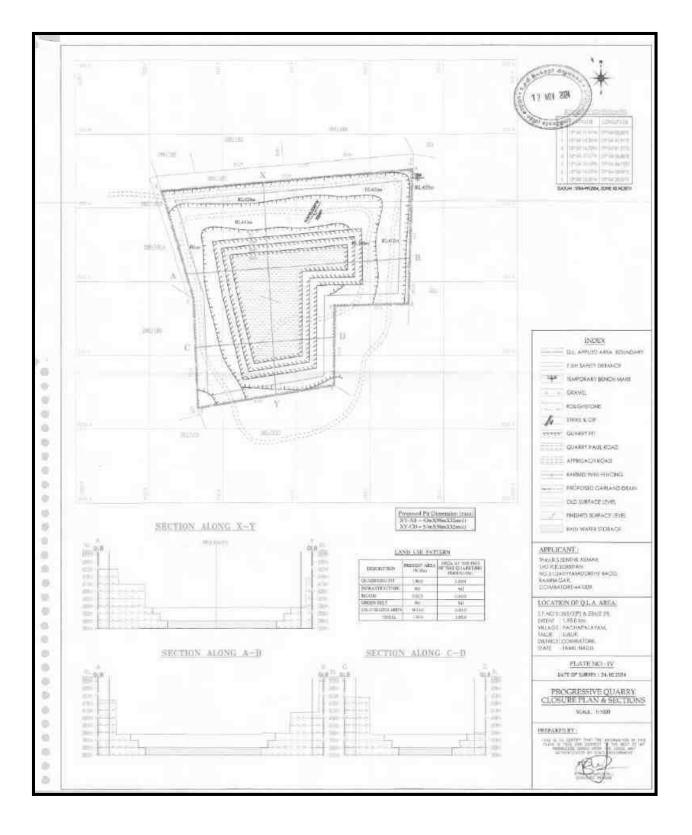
CLOSURE PLAN AND SECTIONS
